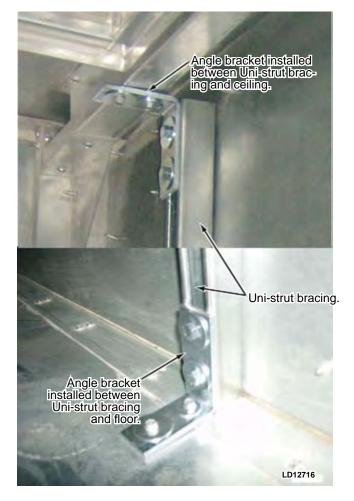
INSTALL BRACING TO MIXING DAMPER WALL ON EITHER SIDE OF DAMPERS
